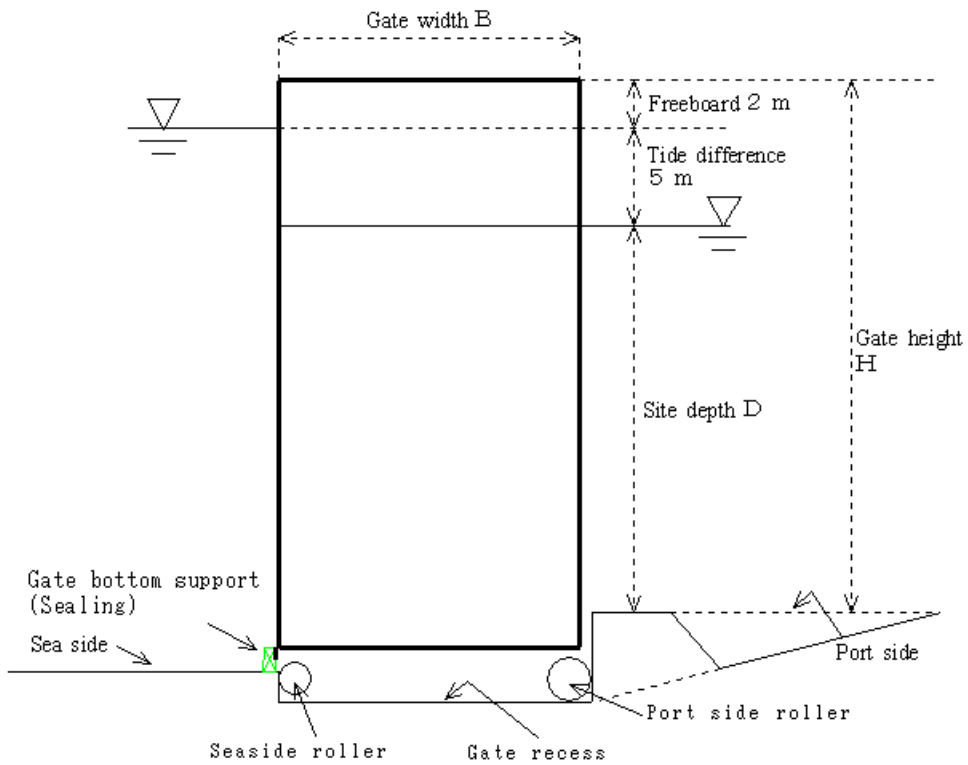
5 Bottom roller arrangement (Seaside water tightness)
